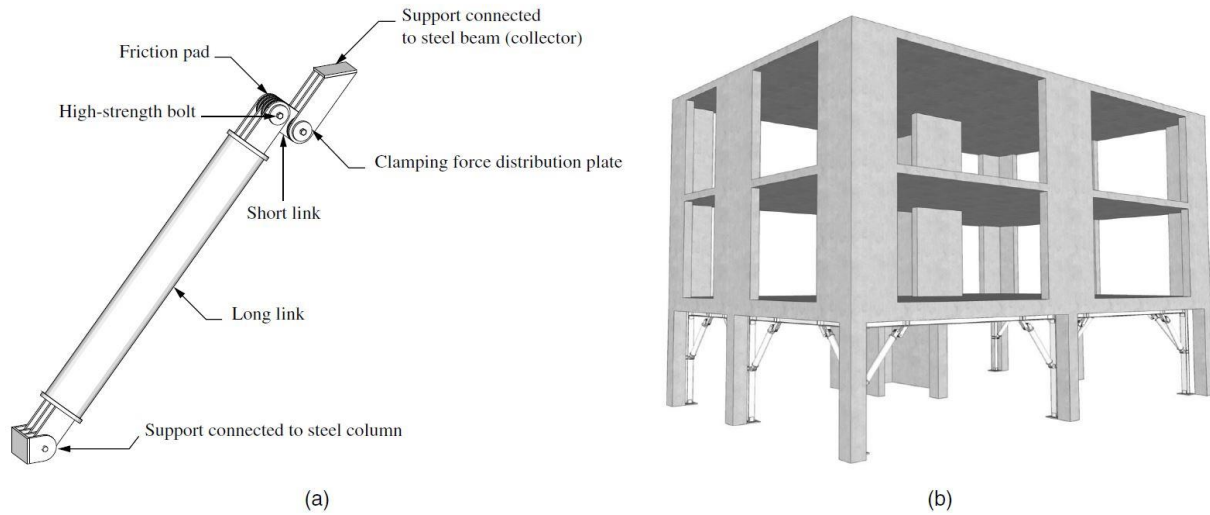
Proposed retrofit system (a) details of the damper, (b) installation scheme. (Javidan and Kim 2019)
